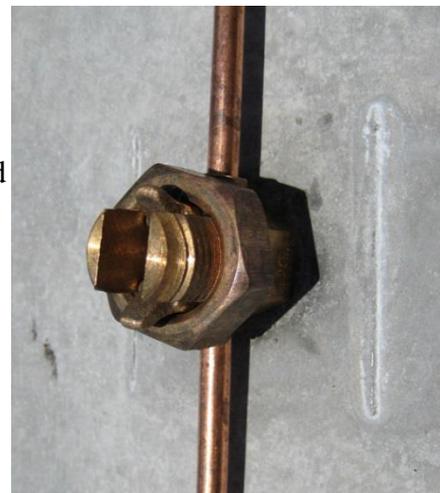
Grounding Lug Bonded to Internal Steel Reinforcement
